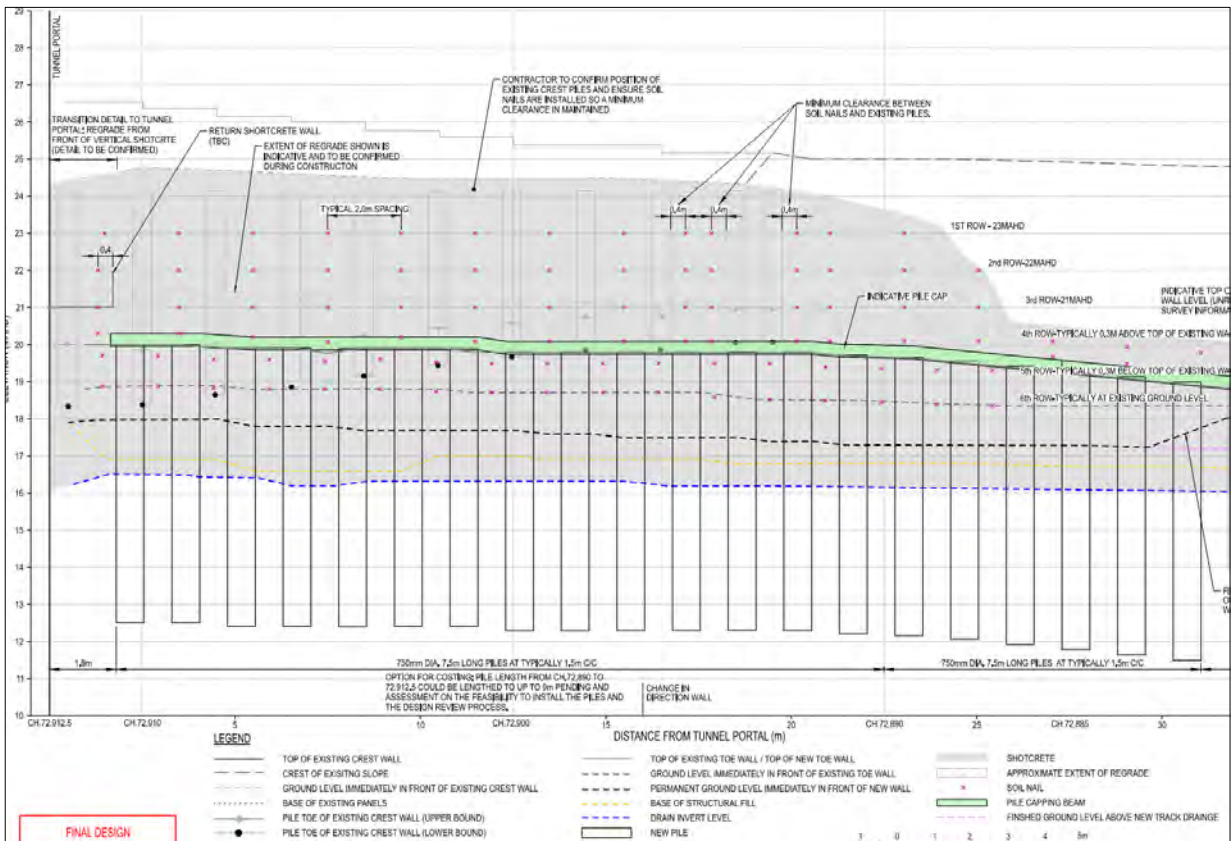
ELEVATION SHOWING RETAINING WORKS ON WEST APPROACH AT DOWN END PORTAL. (SOURCE: AURECON/VLINE)
